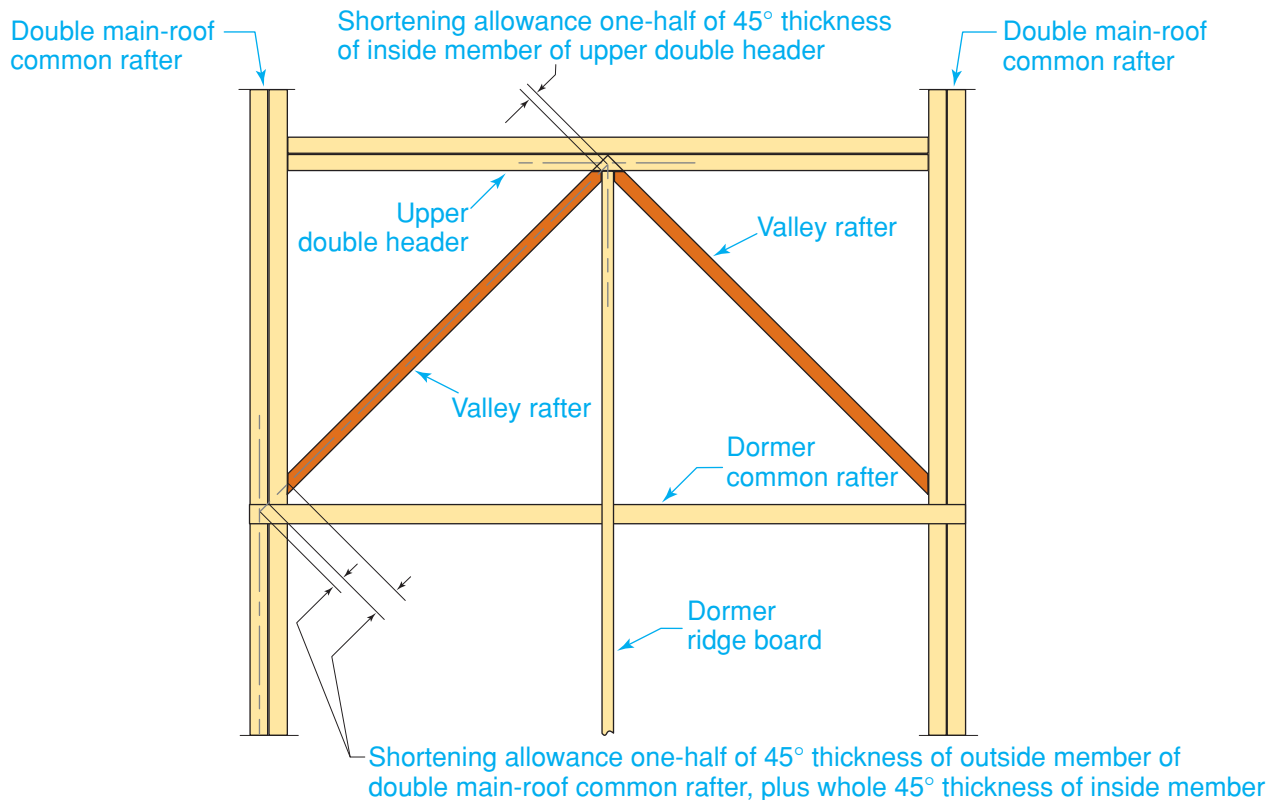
Valley Rafter Shortening: Dormer With Side Walls
